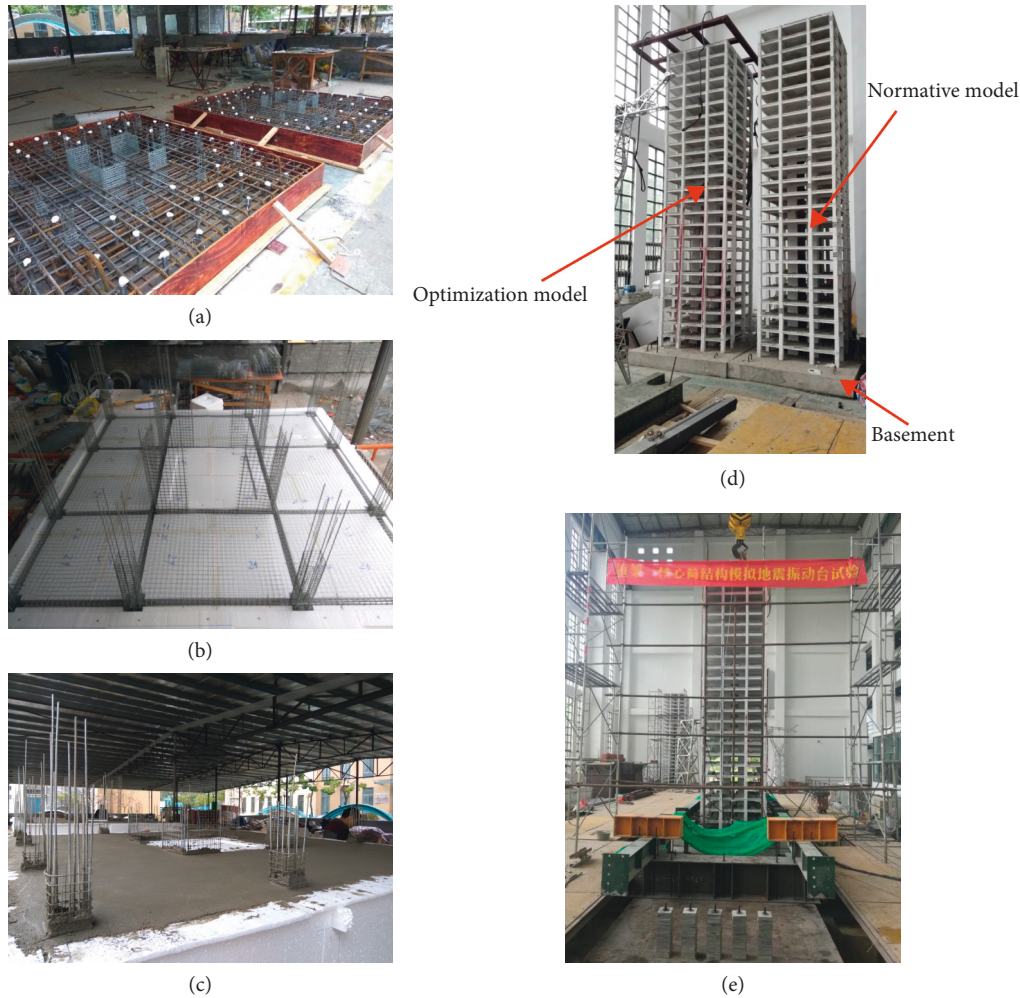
Model construction: (a) basement construction, (b) layout of iron wire and foam template, (c) pouring of microconcrete, (d) finish construction of models, and (e) shaking table model panorama.
